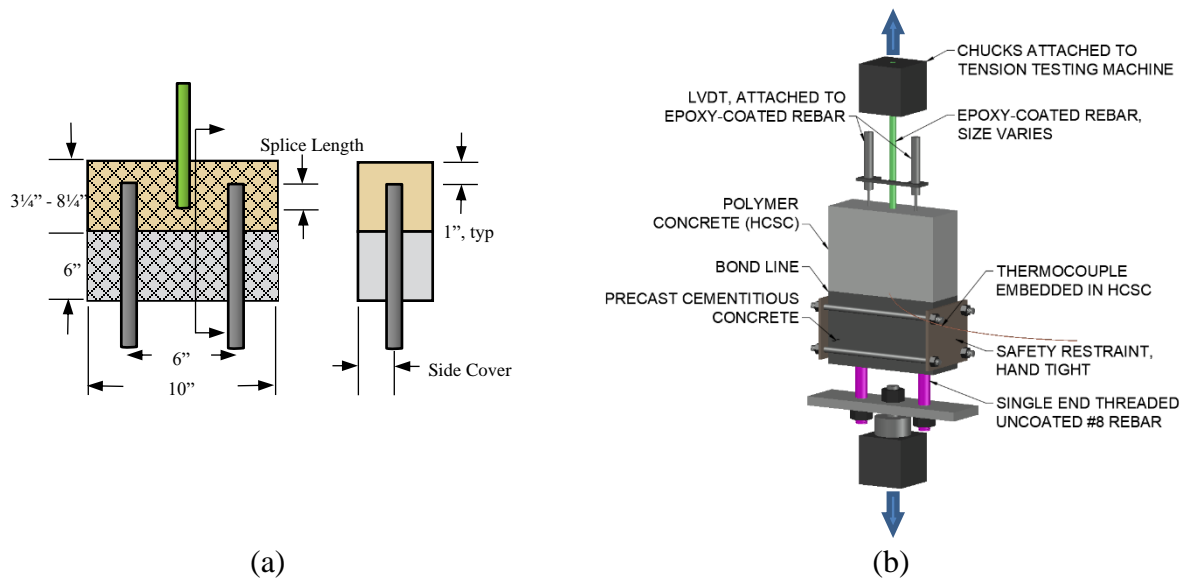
(a) Elevation and section view of non-contact splice specimen, (b) diagram of testing setup
